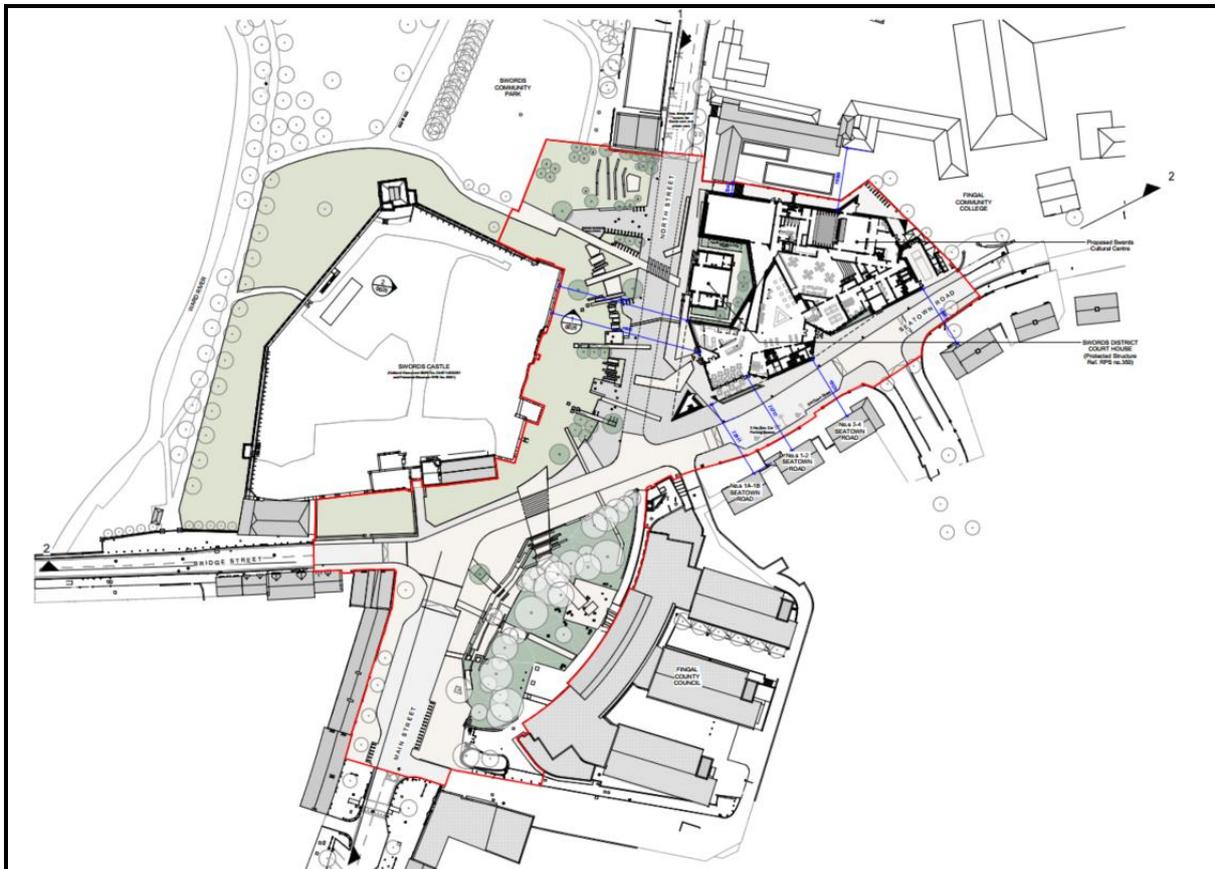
Proposed Swords Cultural Quarter - Site Plan
